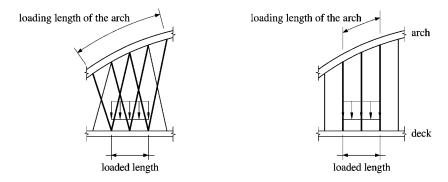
Use of inclined hangers to introduce load into the arch.
